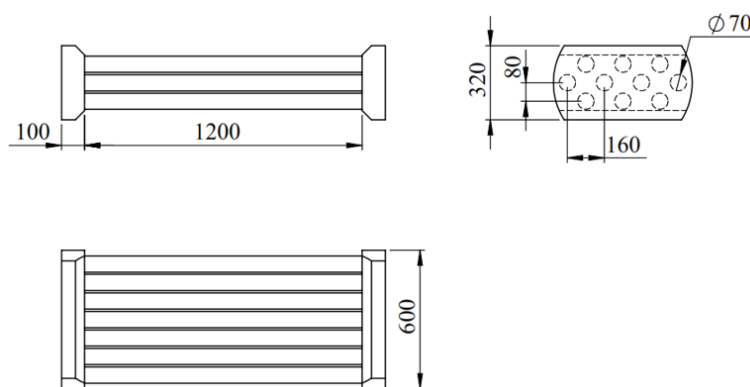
Model dimension of the heated pipes (dimension in mm)
